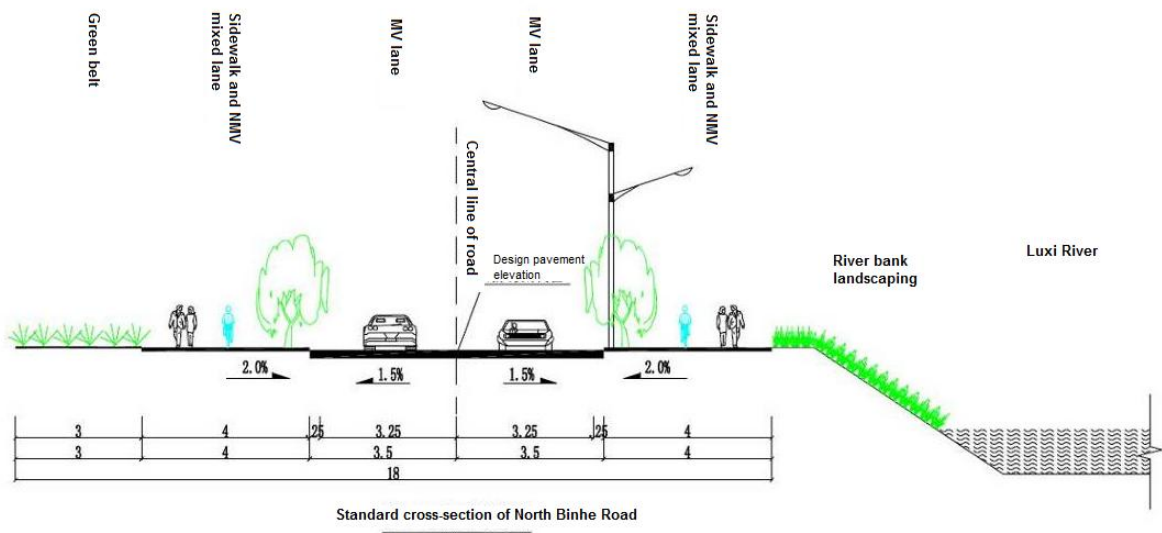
Cross-sectional Diagram of Urban Branch Road
